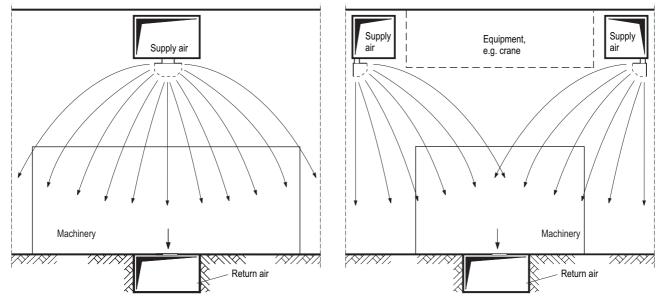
Air jet pattern of trapezoidal / semi-trapezoidal displacement outlet
